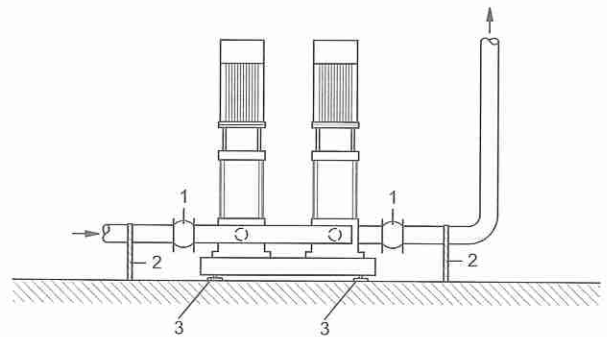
Sketch showing the position of expansion joints, pipe supports and machine shoes
